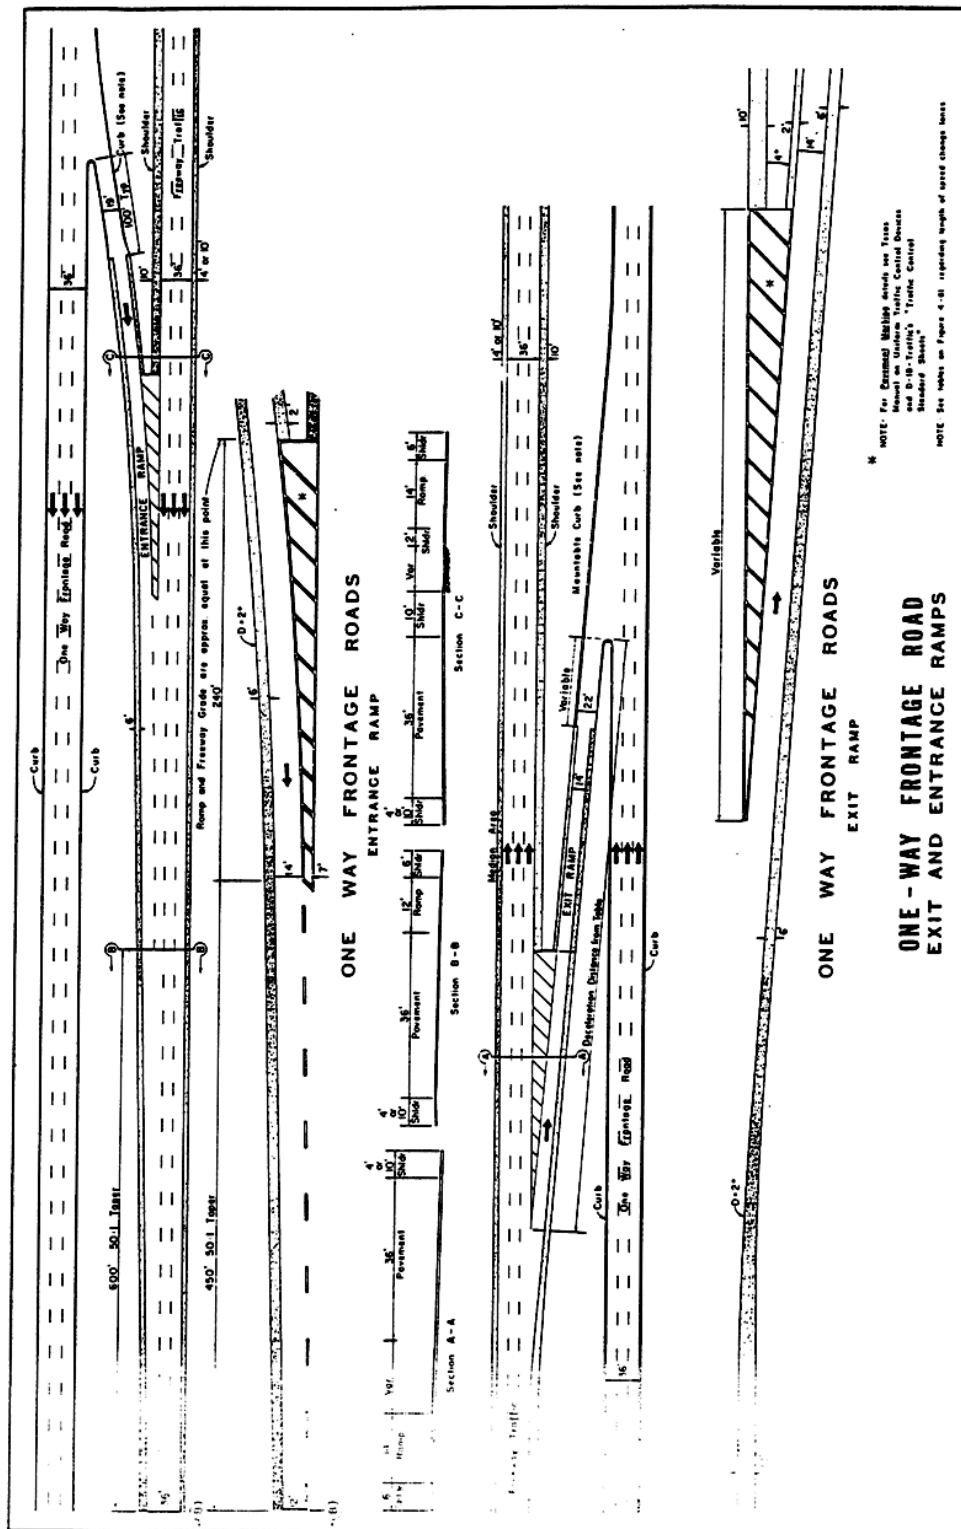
TxDOT One-Way Frontage Road Ramps [3]
